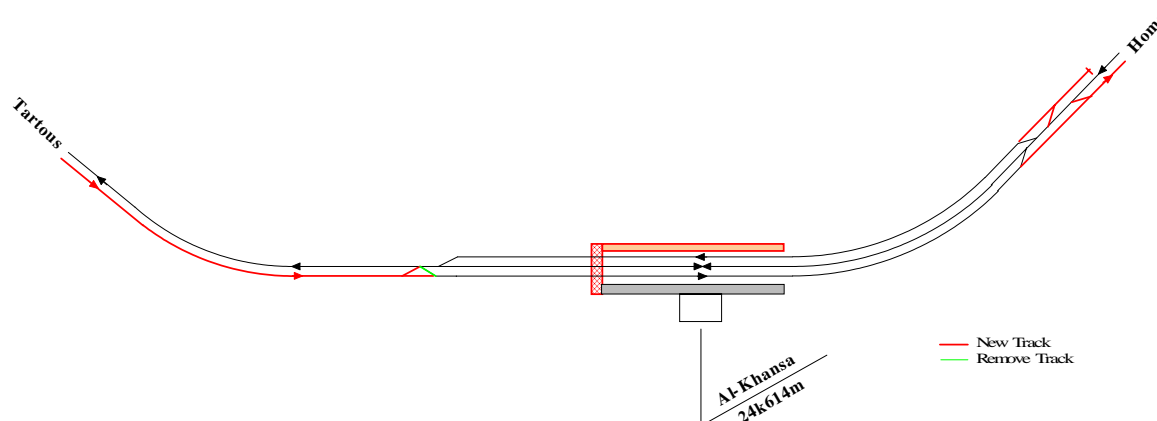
Sketch of Al-Khansa station track layout
